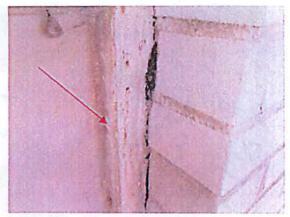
View of window glazing compound (HA-F) on windows throughout the building.
